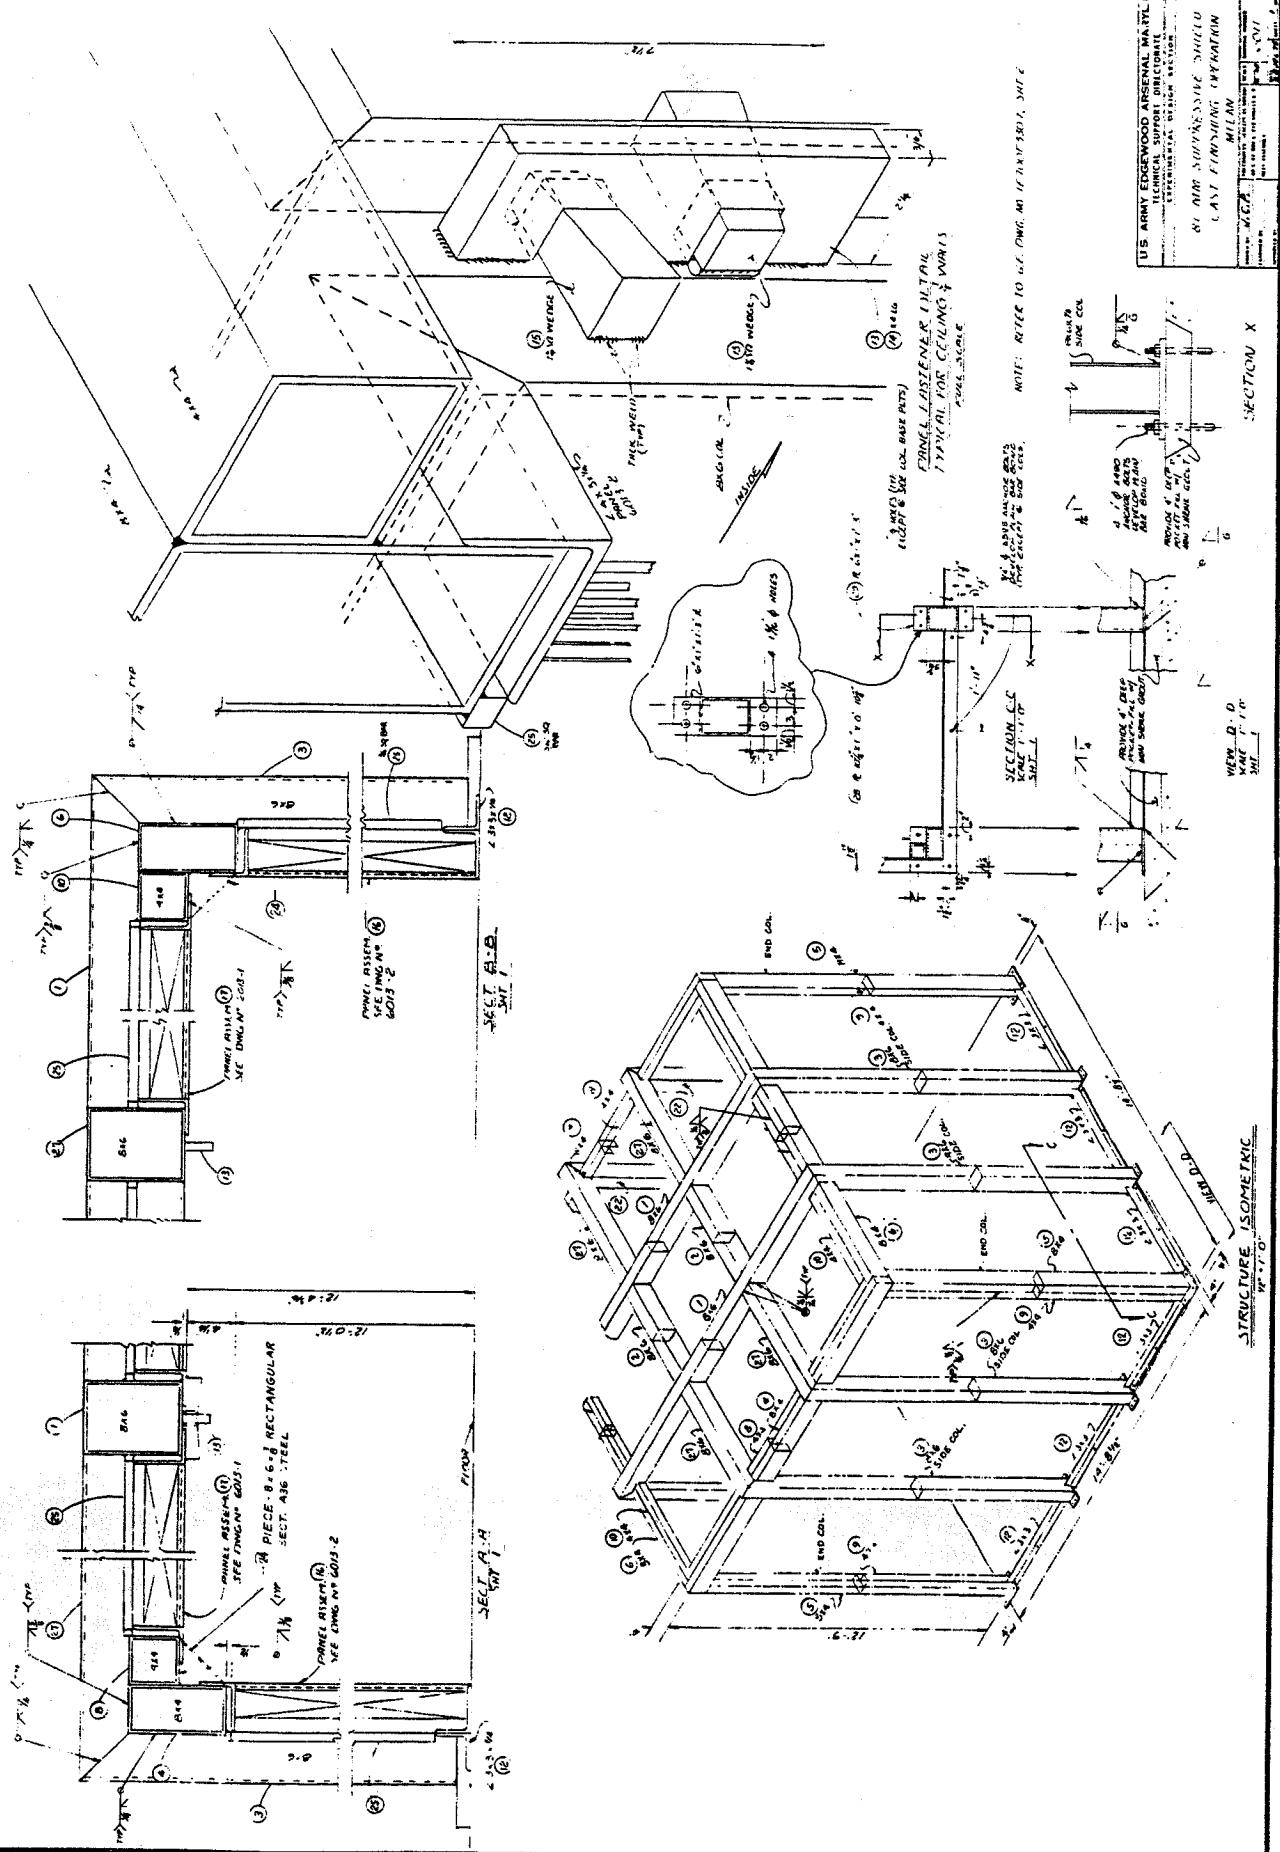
Milan 81-mm Suppressive Shield Construction Details (continued)
